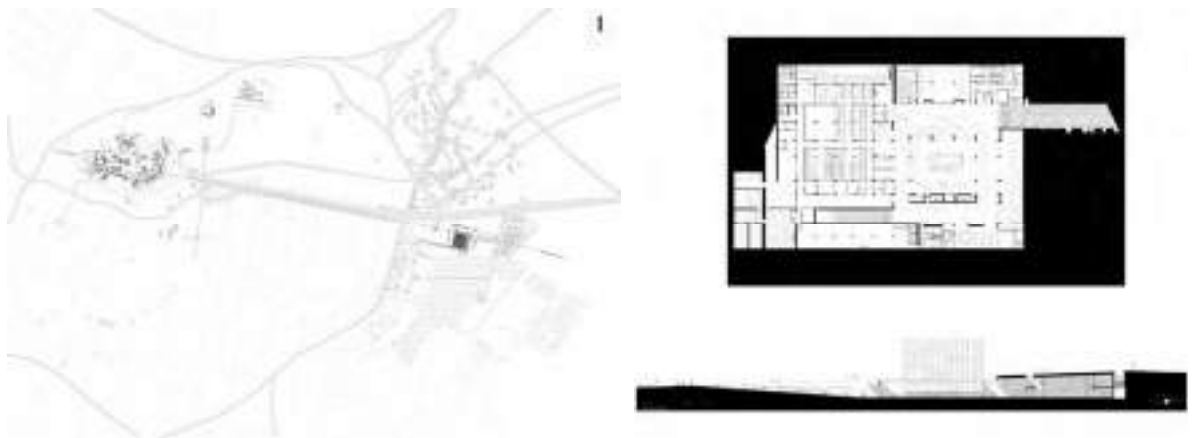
Site plan, floor plan and section (Yalin Architecture Archive, 2020).
